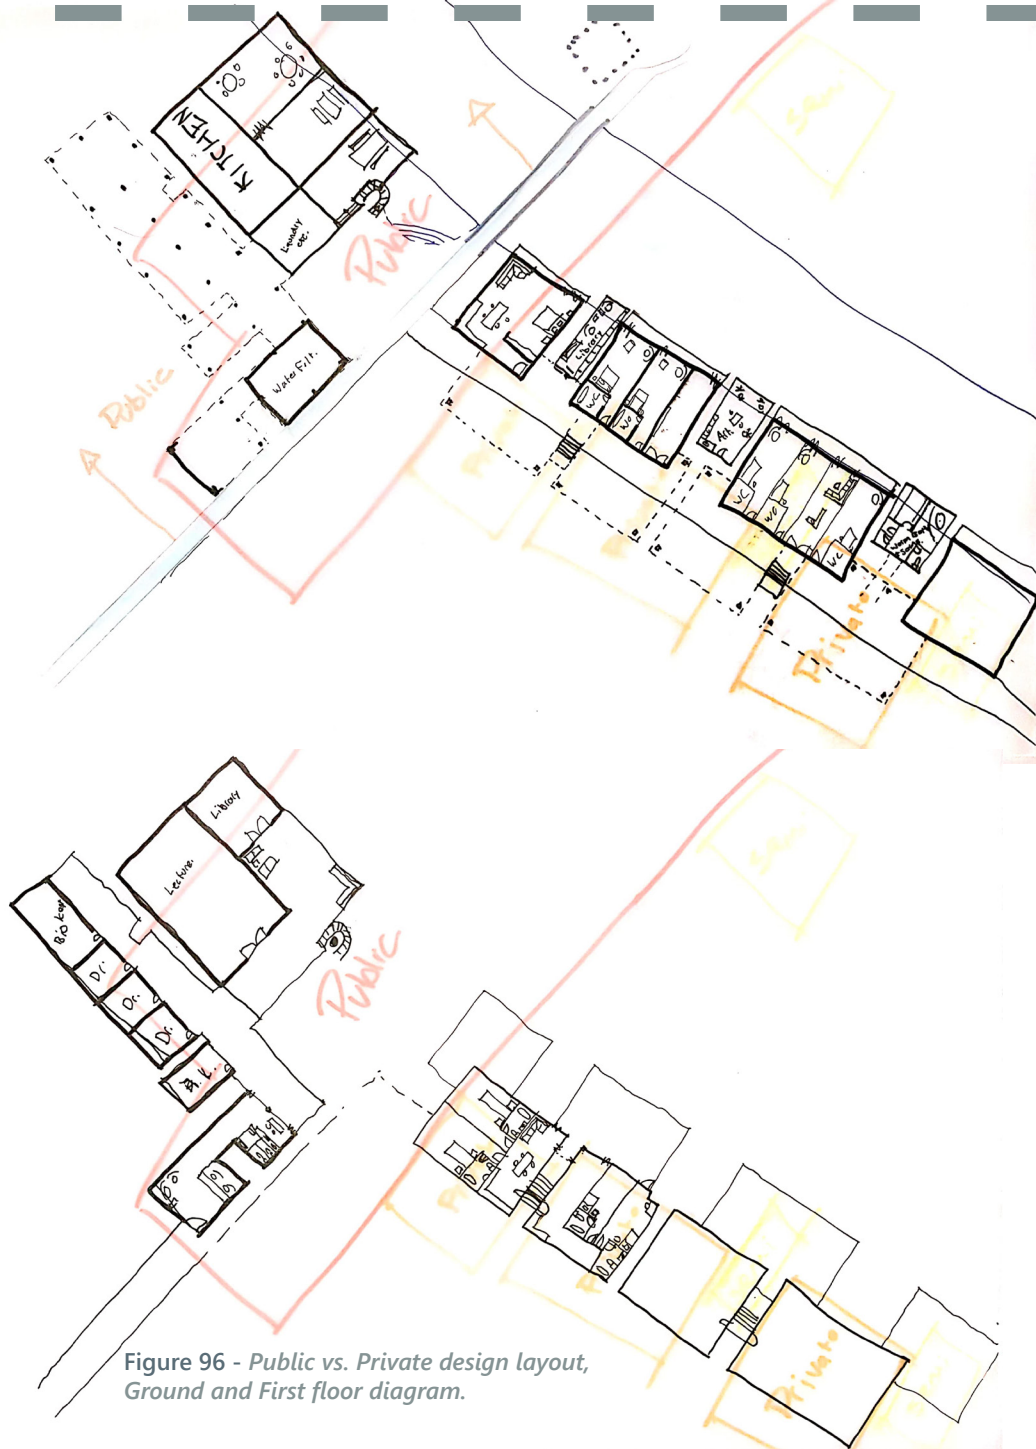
Public vs. Private design layout, Ground and First floor diagram.
